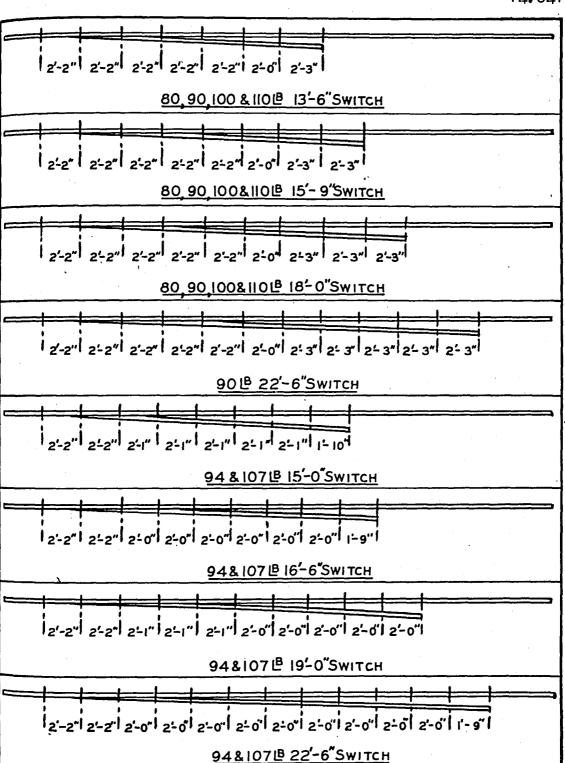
SPACING OF CHAIR BOLTS Y LAYOUT STOCK RAILS
